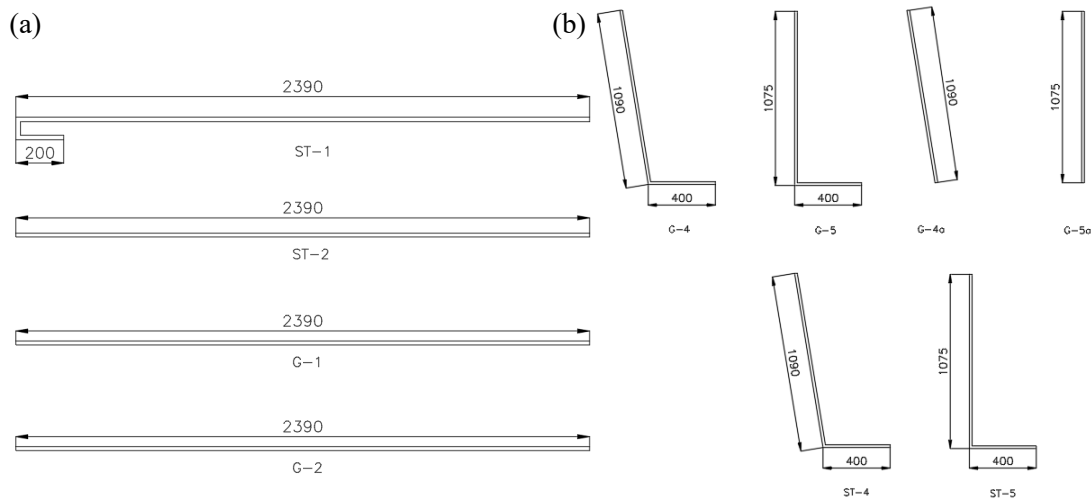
reinforcement dimensions for (a) deck, and (b) barrier. All dimensions in mm.
